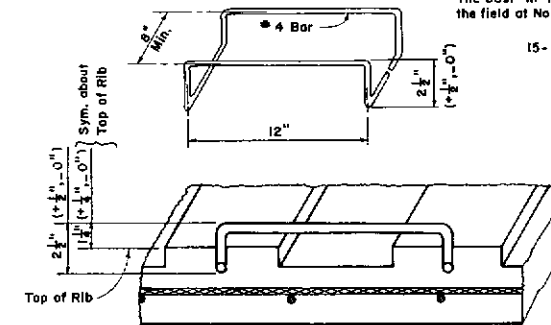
DETAIL RIBBED-PRECAST PRESTRESSED PANELS-RECTANGULAR
